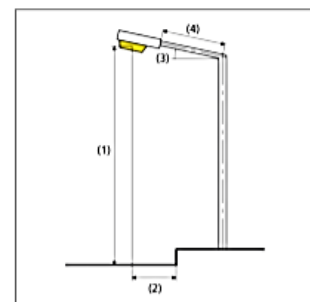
| Installation Settings on the “Avenue Général de Gaulles Road”, (© IfaS)
